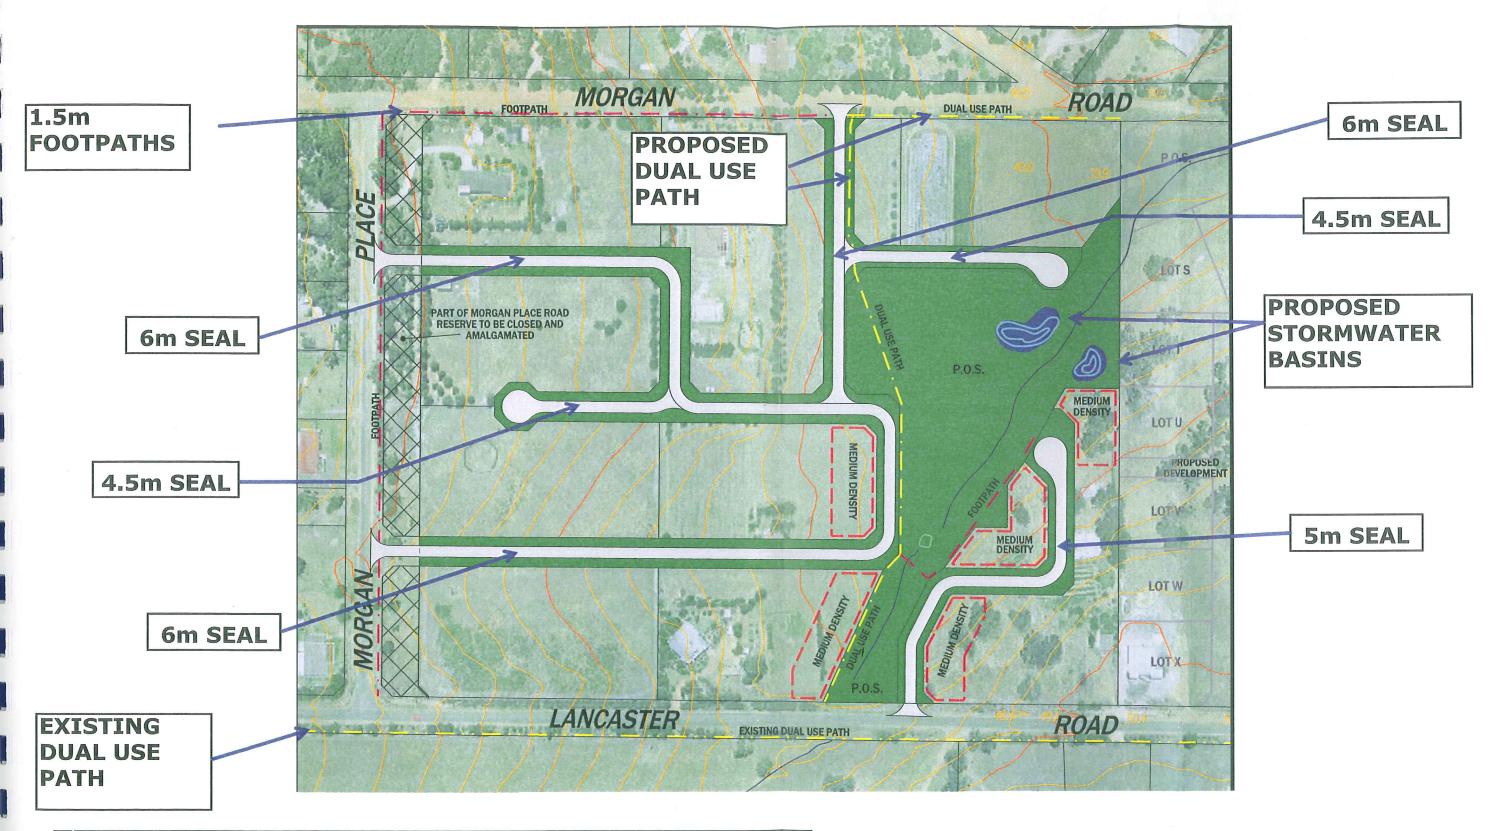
ROADS, DRAINAGE AND FOOTPATHS PLAN
